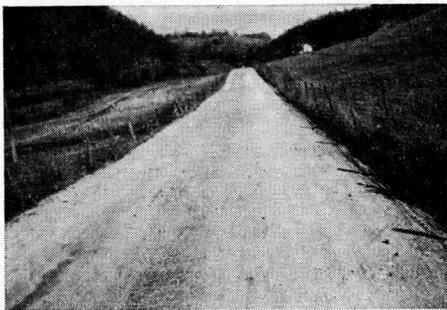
Quartzite and Shale Soil Area—Washington County—Rt. 58—Heavy Traffic, Poor Subgrade, and Improper Drainage Caused Base and Surface Failure. Macadam Base with Light Bituminous Surface
